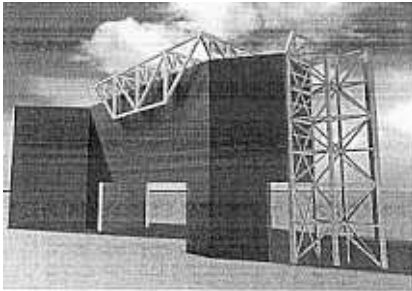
Overview on the roof truss of the Sony Centre in Berlin, Germany
